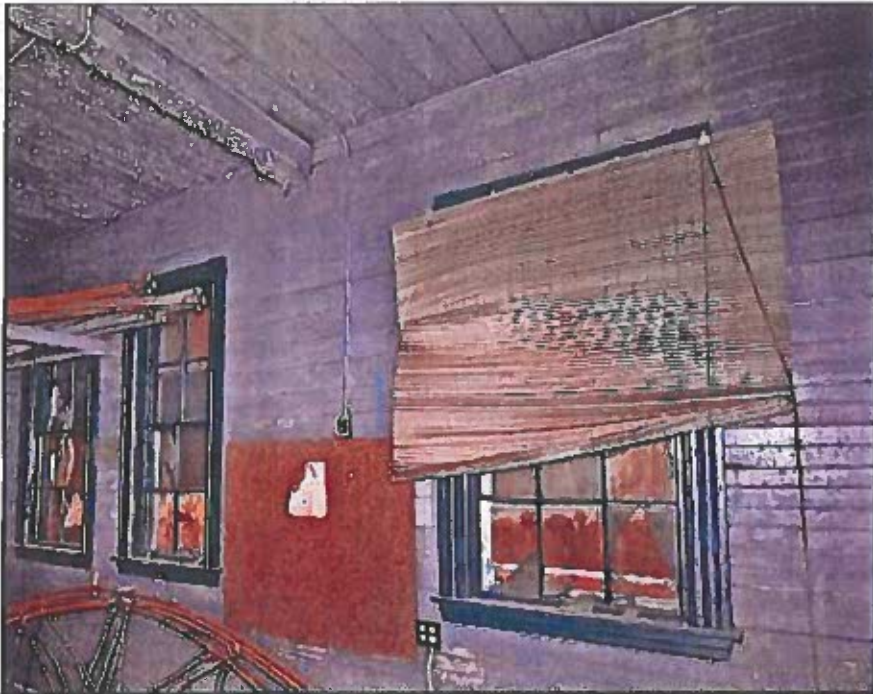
Interior of main barn first floor showing matched boarding on walls and ceiling that is the original interior finish and should be retained and preserved. Beam in ceiling is the bottom chord of a loft level roof truss
